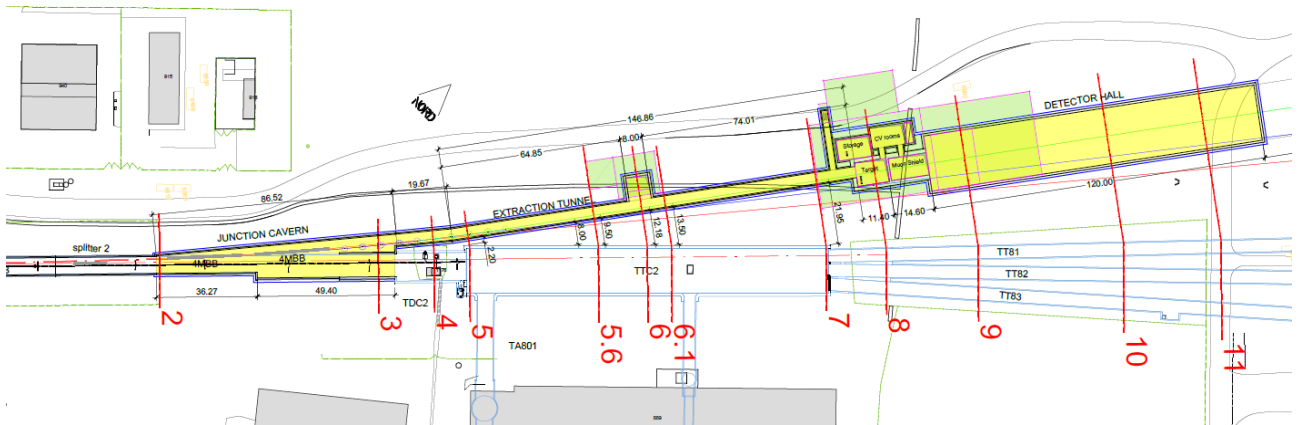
Top view of the new SHiP underground and surface areas with the main cross sections along the beam-line
